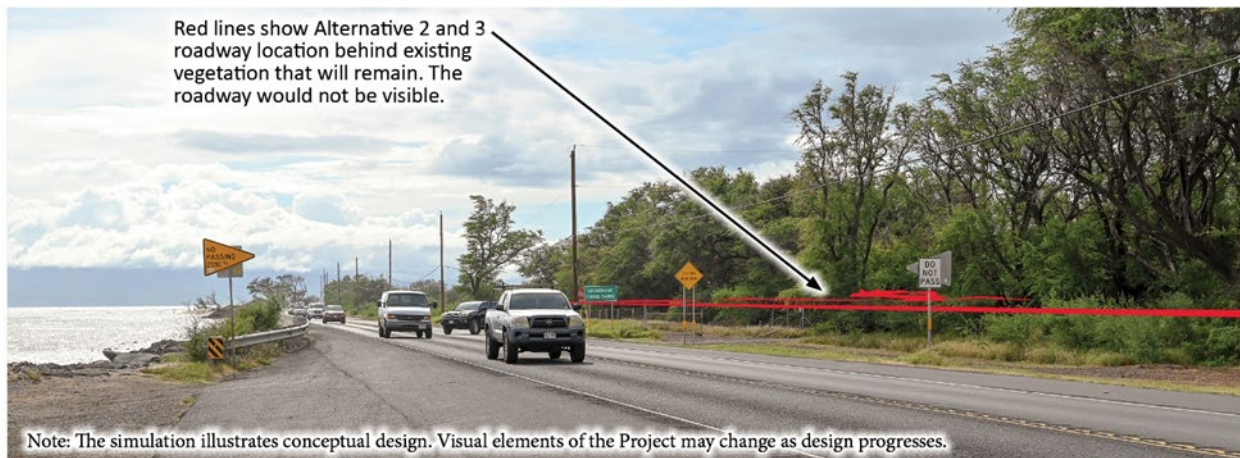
Key Viewpoint 12 – Pāpalaua Wayside Park: Existing Conditions/No Build Alternative and Build Alternatives 2 and 3 (looking west)
